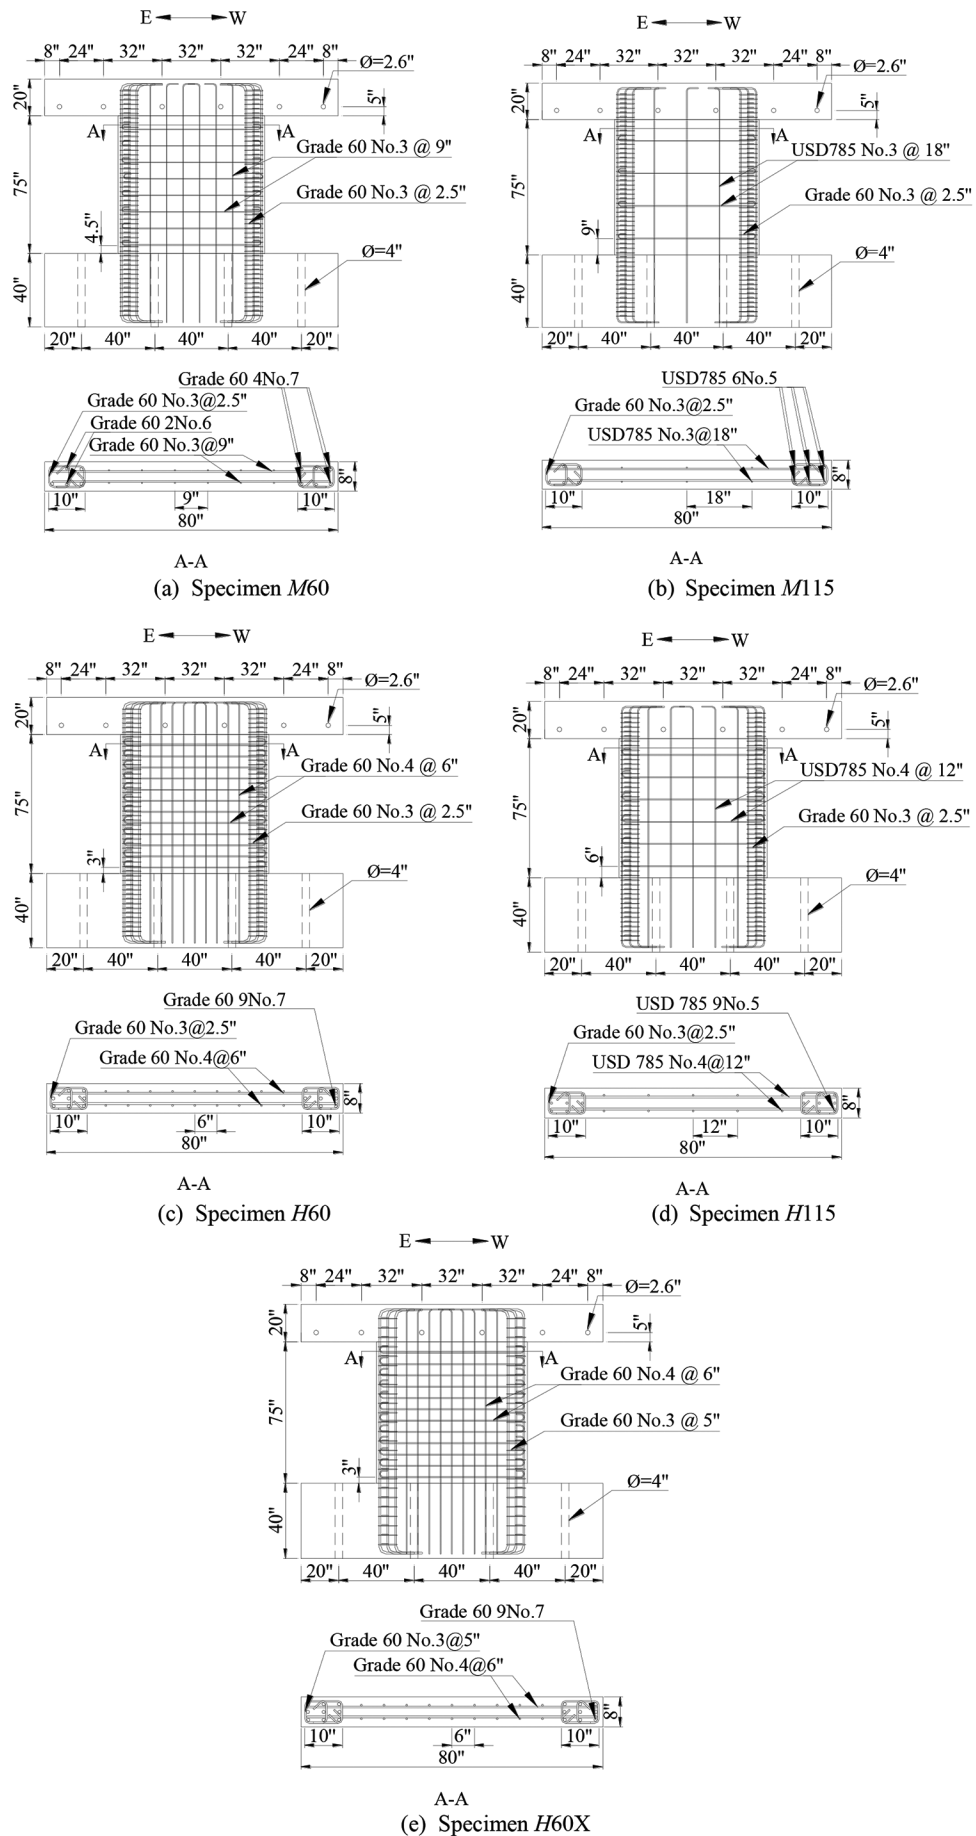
Nominal dimensions and reinforcement layout for test specimens. (Note: 1 in. = 25.4 mm.)
